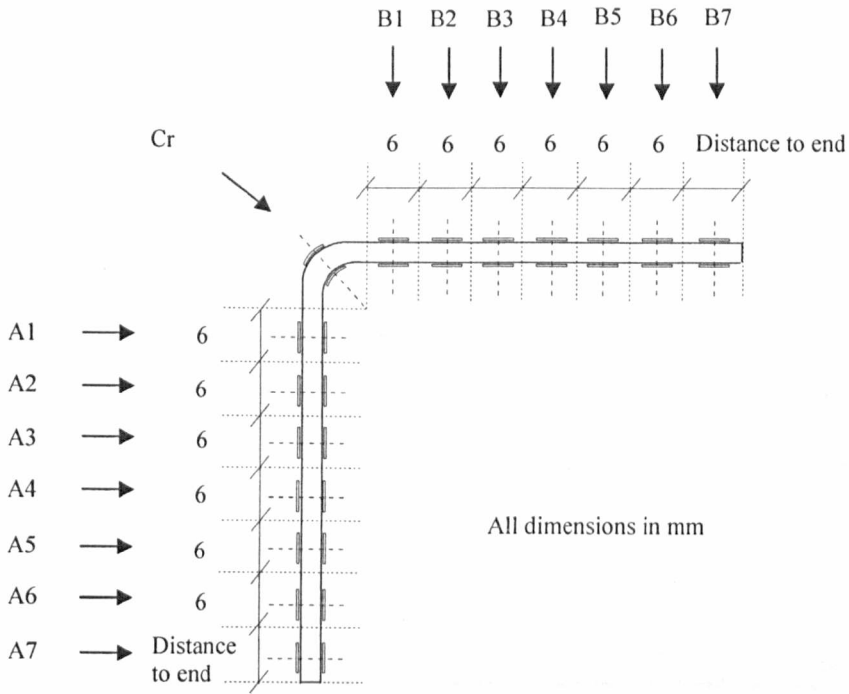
Setting out of press braked section PB2 50×50×2 ($r_i=3.2$)
